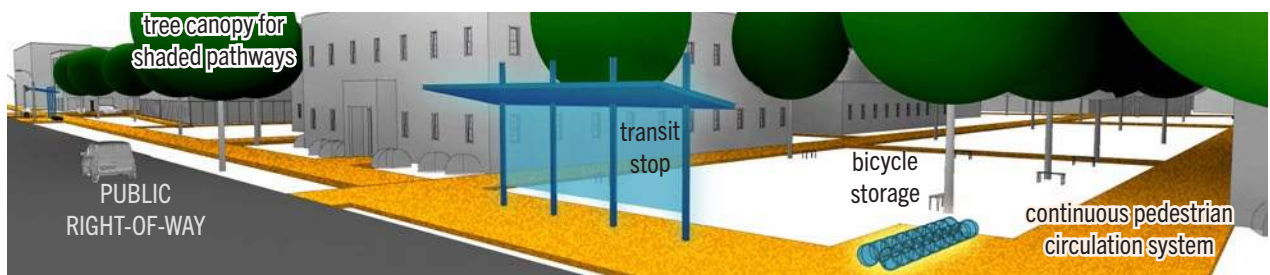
Driveway, Sidewalks, and Transportation Examples
